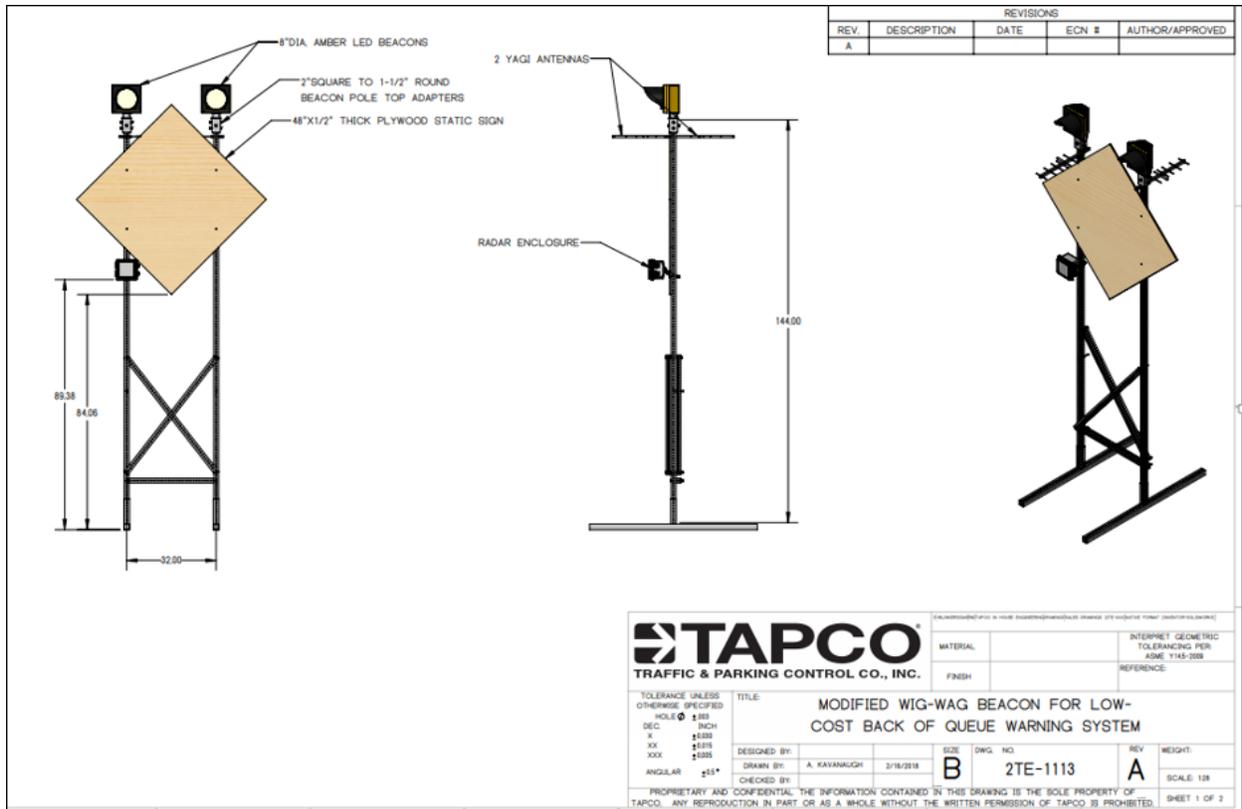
Design 2, alternative #2 conventional 8 in. beacons on TxDOT sign support system
